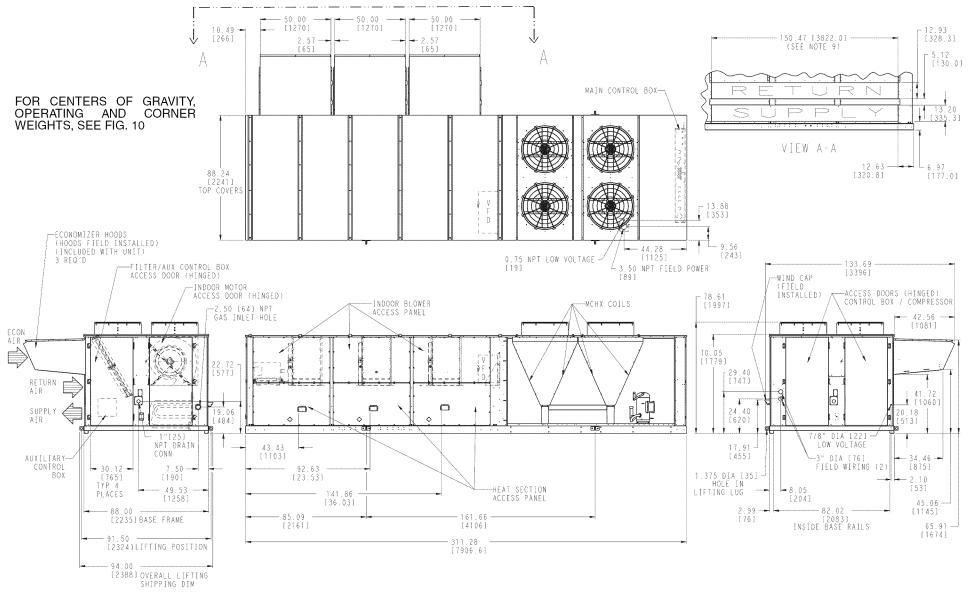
Base Unit Dimensions — 48A4,A5060
